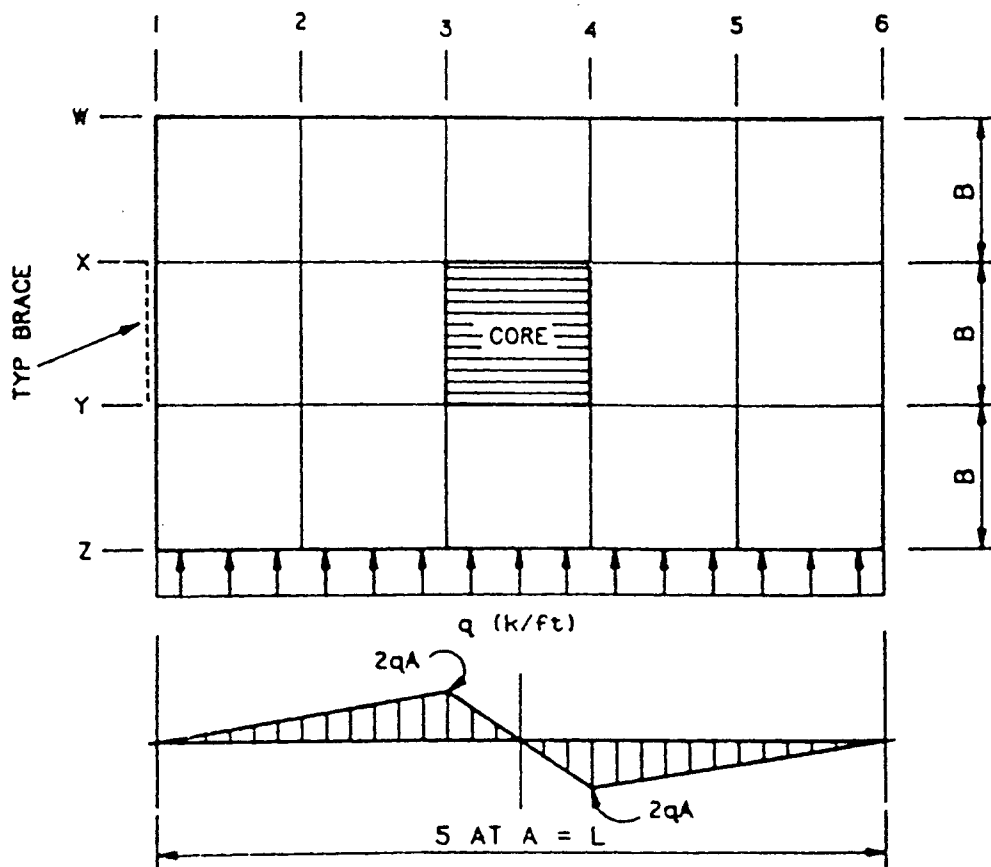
FLOOR PLAN AND SHEAR DIAGRAM
